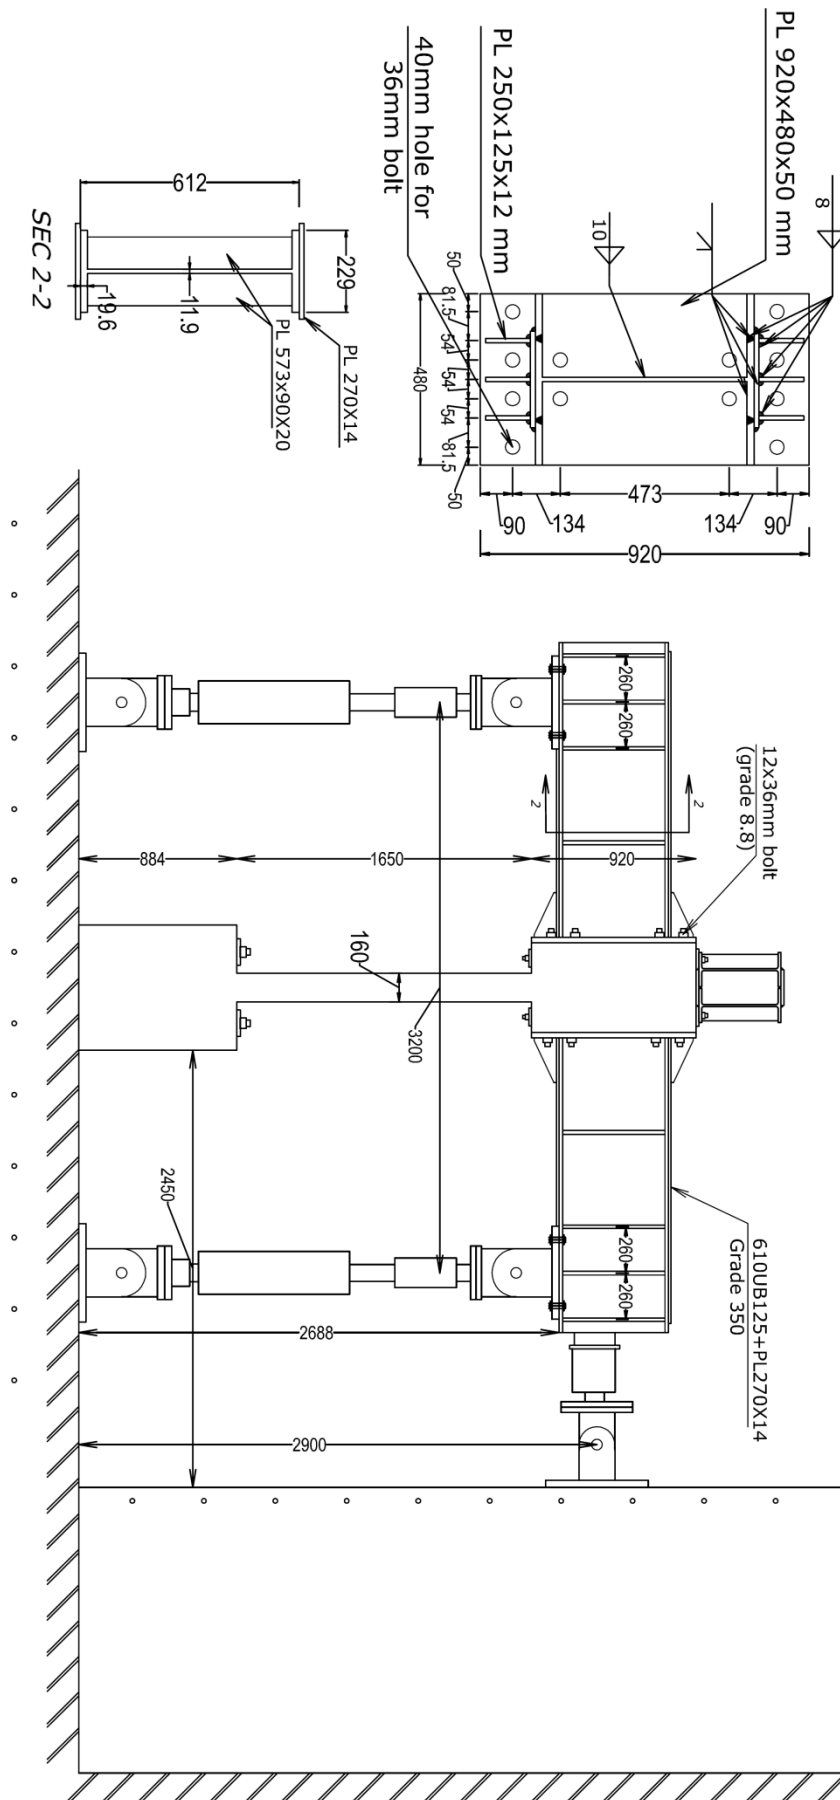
Schematic view of the test setup – Elevation (out-of-plane; right view)
